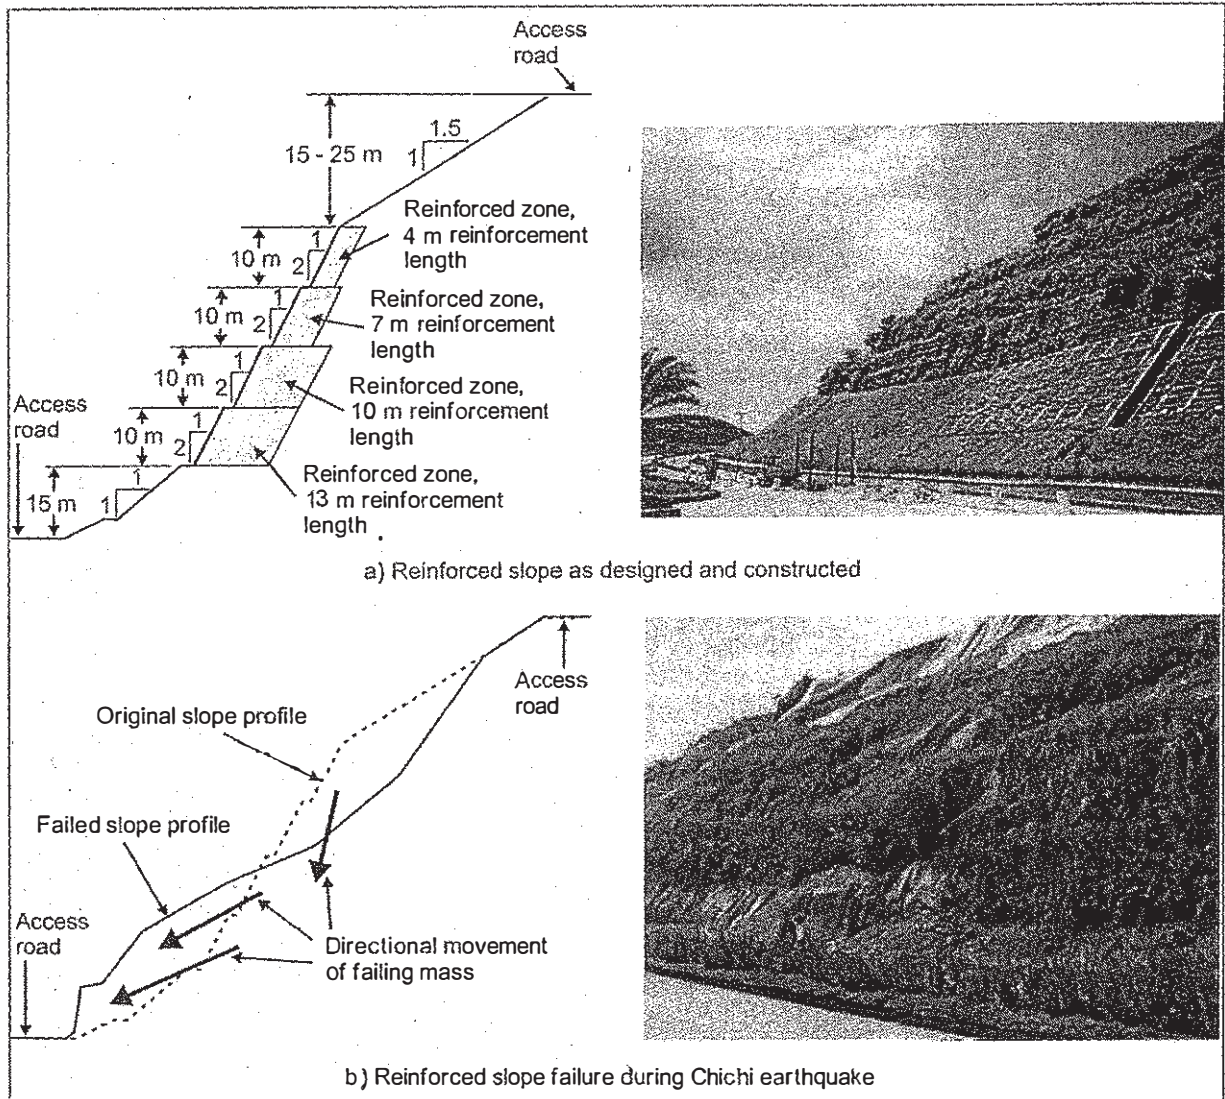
Reinforced fill slope failure, Chi-Nan, Taiwan.
